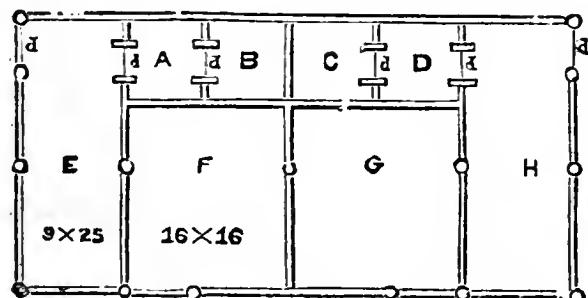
PLAN OF FOWL HOUSE AND YARD.
